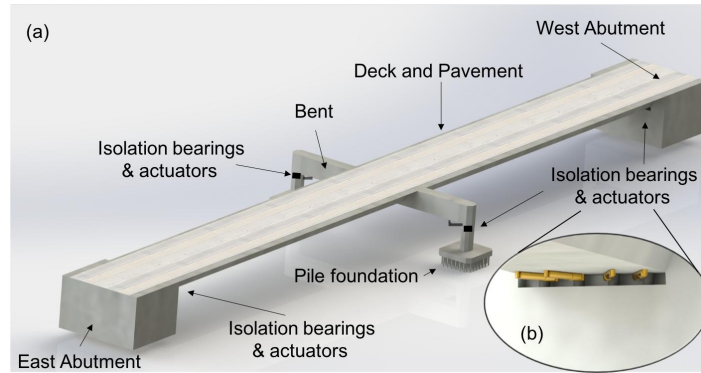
Three-dimensional view of bridge structure equipped with isolation bearings and control devices.
